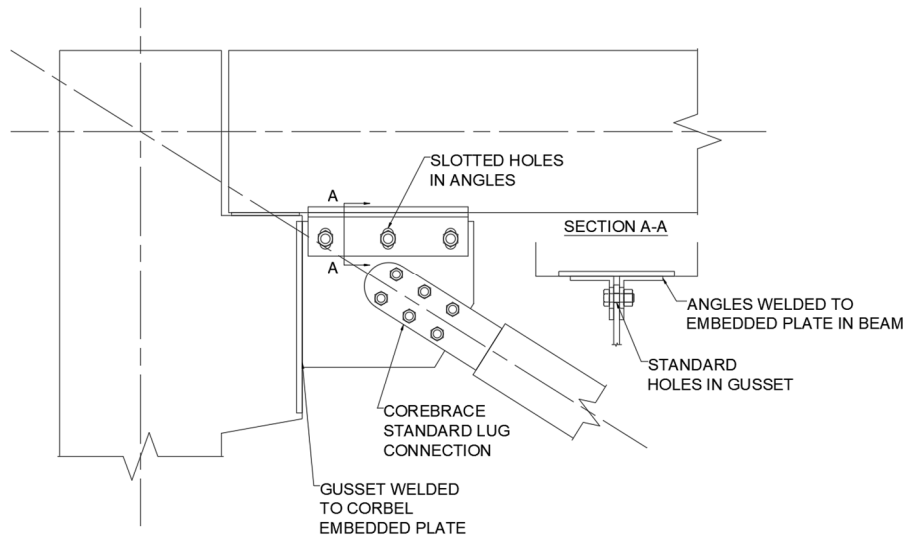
Connection with bolts in double shear, slotted holes to prevent gravity load transfer
